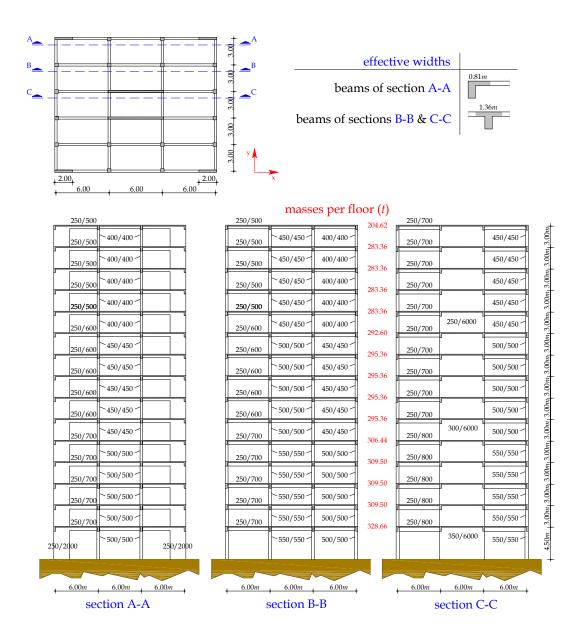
Configurations in plan and in elevation and geometric data for the 15-storey building (same plan configuration applies to the 9-storey building, see [7]).
